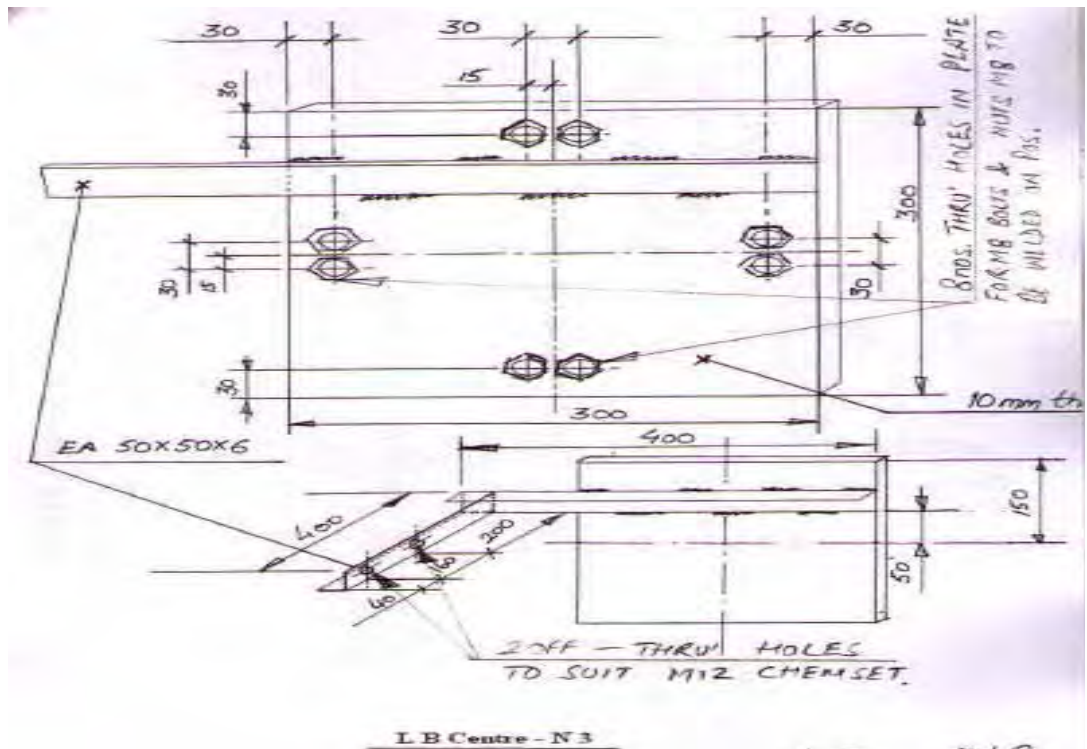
Sketch of bracket plate sitting behind concrete hob.
